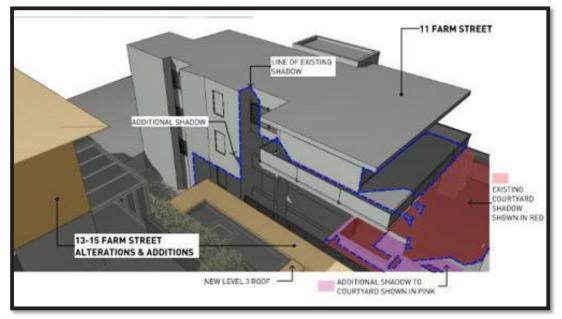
Additional overshadowing onto 11 Farm Street at 1pm.
